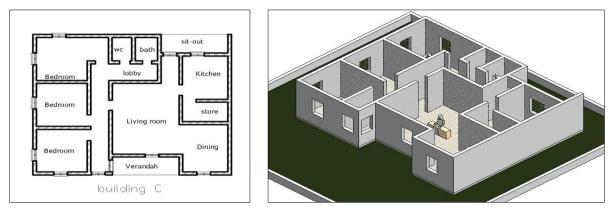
Building C floor plan and 3D model in Autodesk Revit 2018
